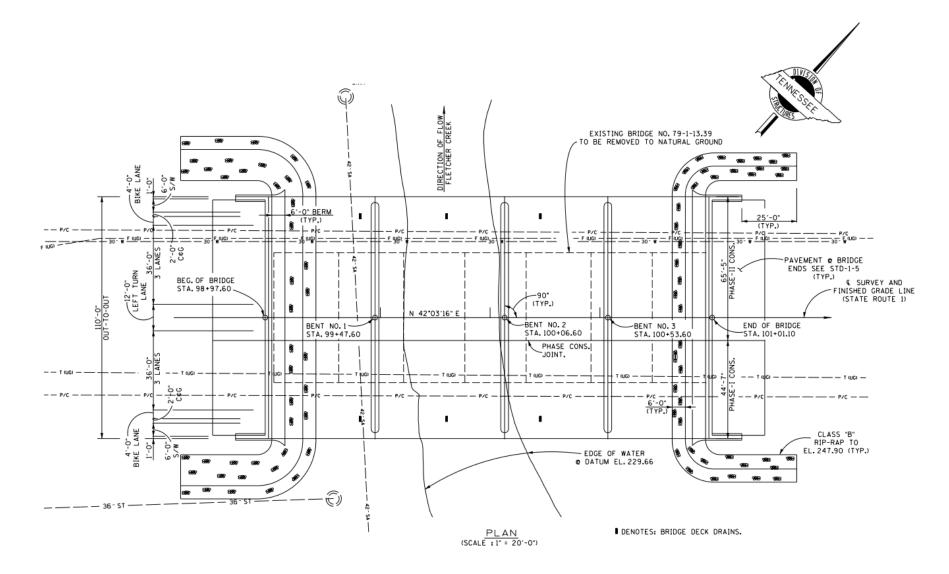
Fletcher Creek Bridge Preliminary Layout Typical Section
